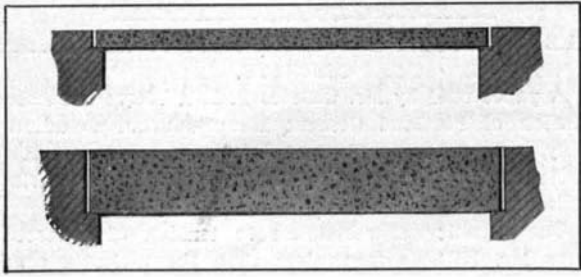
These Beams Are Designed to Carry the Same Load. The Upper is of Reinforced Concrete, the Lower of Plain Concrete.
